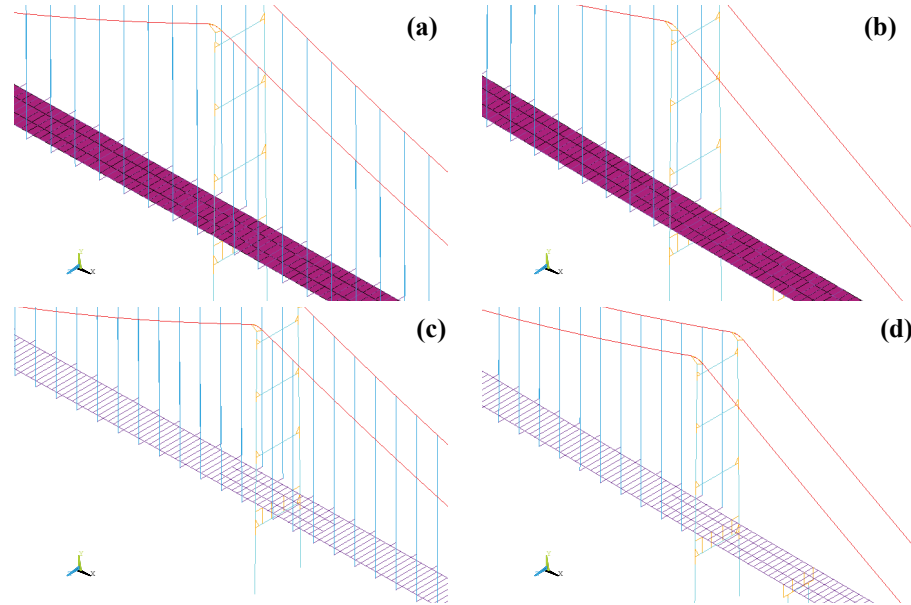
TMR FE model: deck and Ma Wan tower (a); deck and Tsing Yi tower (b); Ma Wan span (c); Tsing Yi span (d)
